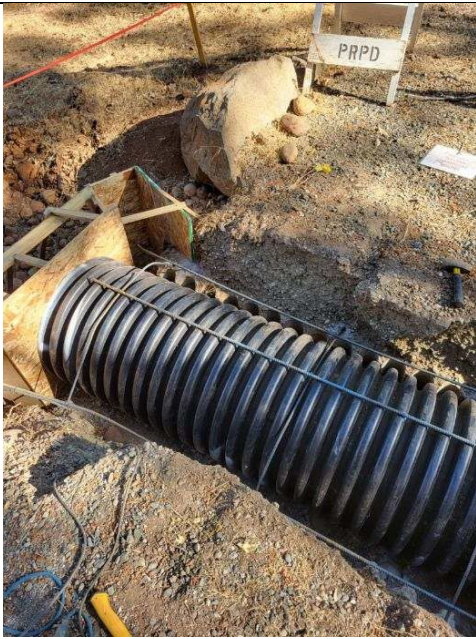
The start of the walking bridge being rebuilt at Lower Bille Park.
